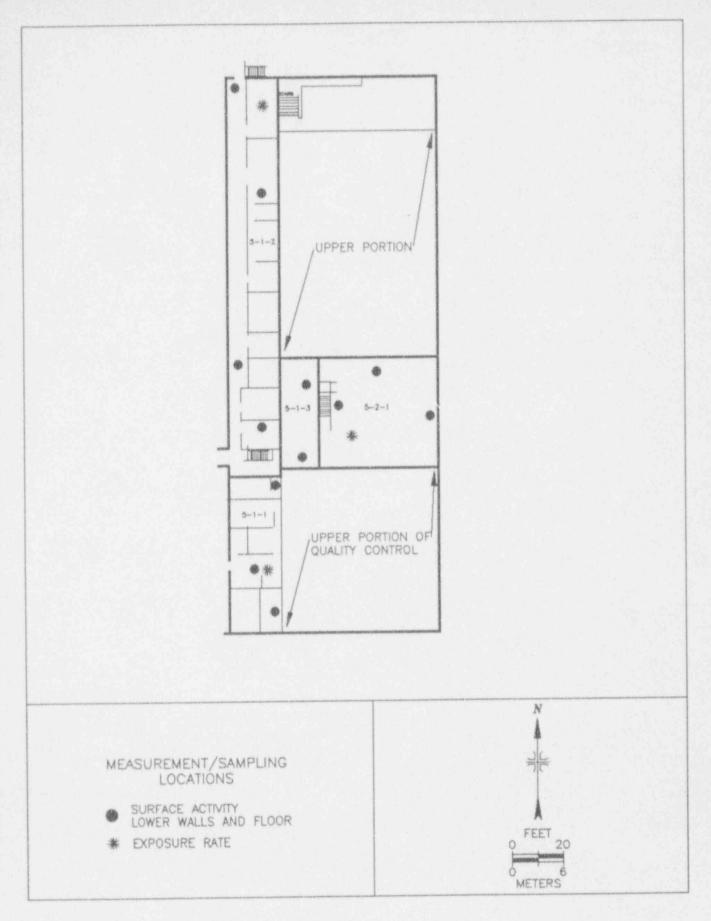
Building 6, Second Floor - Measurement and Sampling Locations
